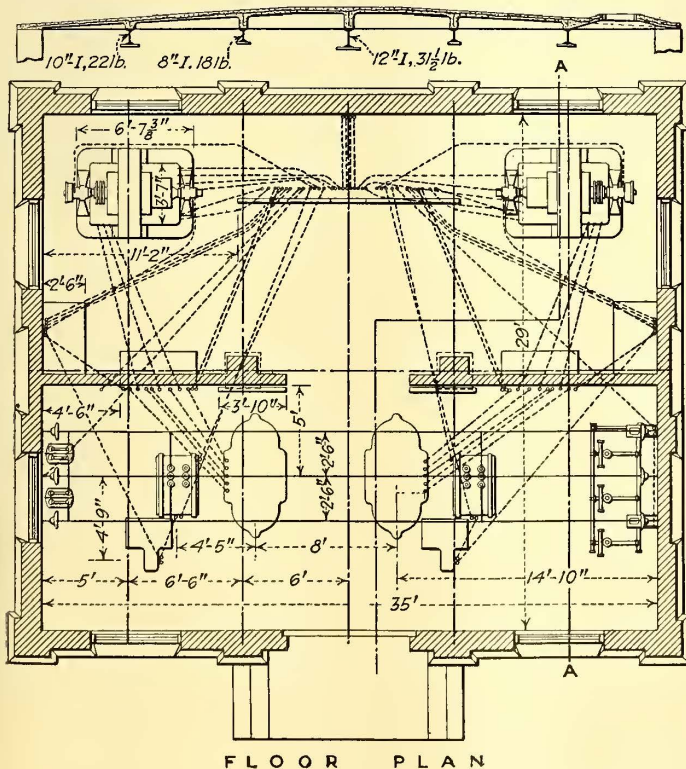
PLAN AND CROSS-SECTION OF BUILDING—OAKLAND SUBSTATION
